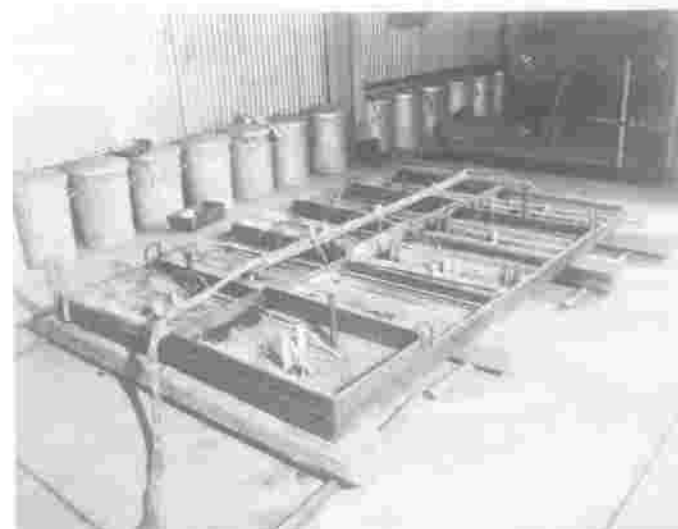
Arrangement of specimens in the FRS thermal insulation tests
